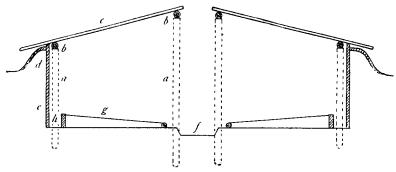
Cross section of Shasta house. a, Posts; b, plate logs; c, roof planks; d, side walls of earth, lined with, e, bark; f, fireplace pot; g, bed of pine needles; h, storage space. (After Dixon.)
